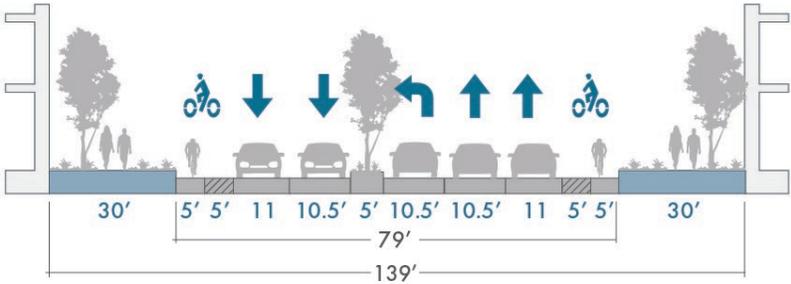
Proposed Street Section, Chapman Avenue East of Bradford Avenue
